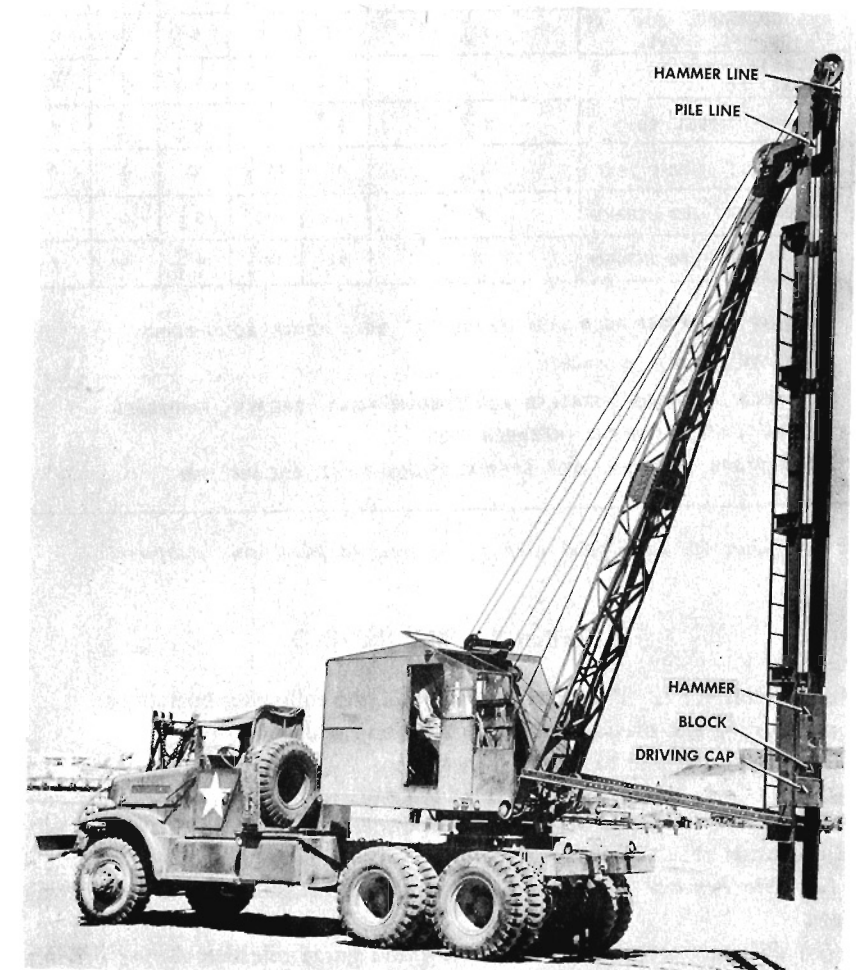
Truck-mounted crane with pile-driving attachment of manufacturer's design.
